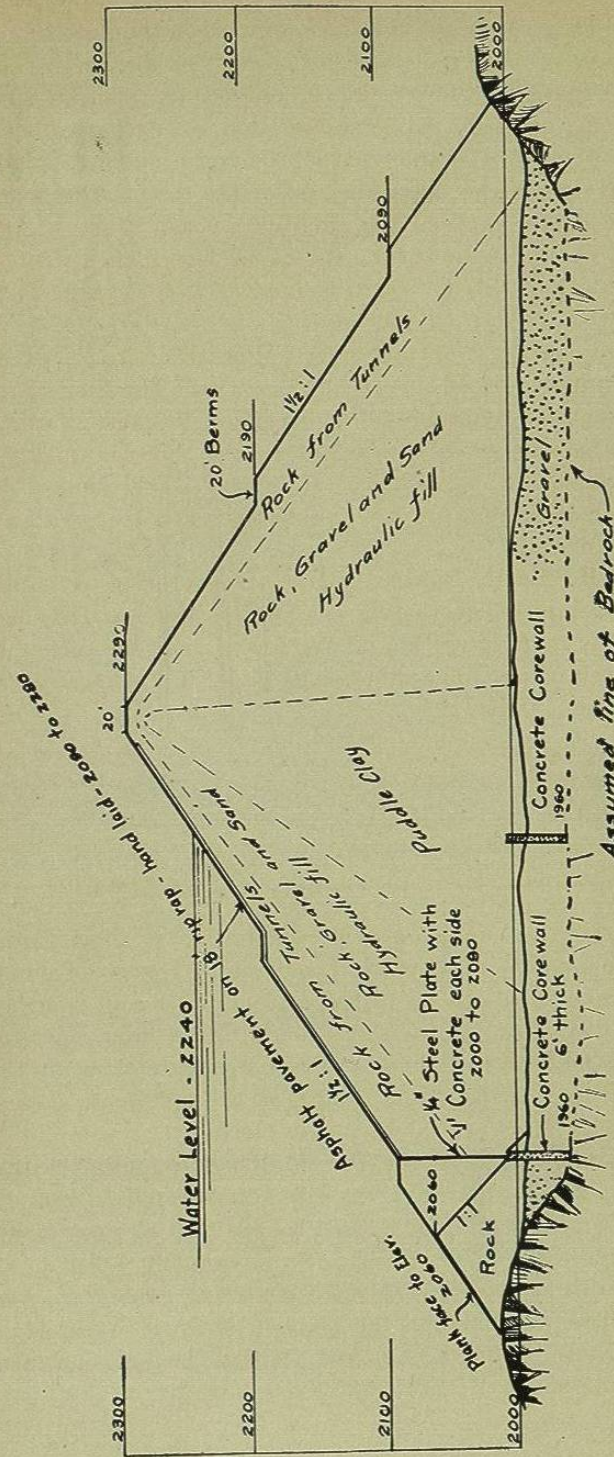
SECTION OF PROJECTED DAM, 320 FEET HIGH, ON THE OIGAWA RIVER, JAPAN.
